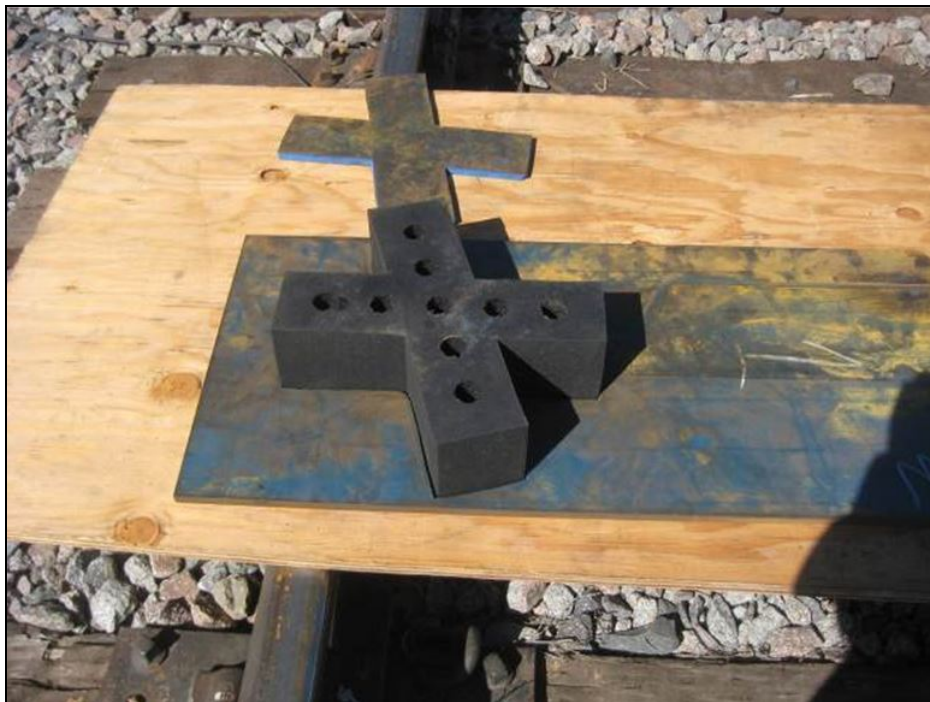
The solid rubber flangeway spacer tile embedded in the full-coverage rail seat Getzner Type B pad
